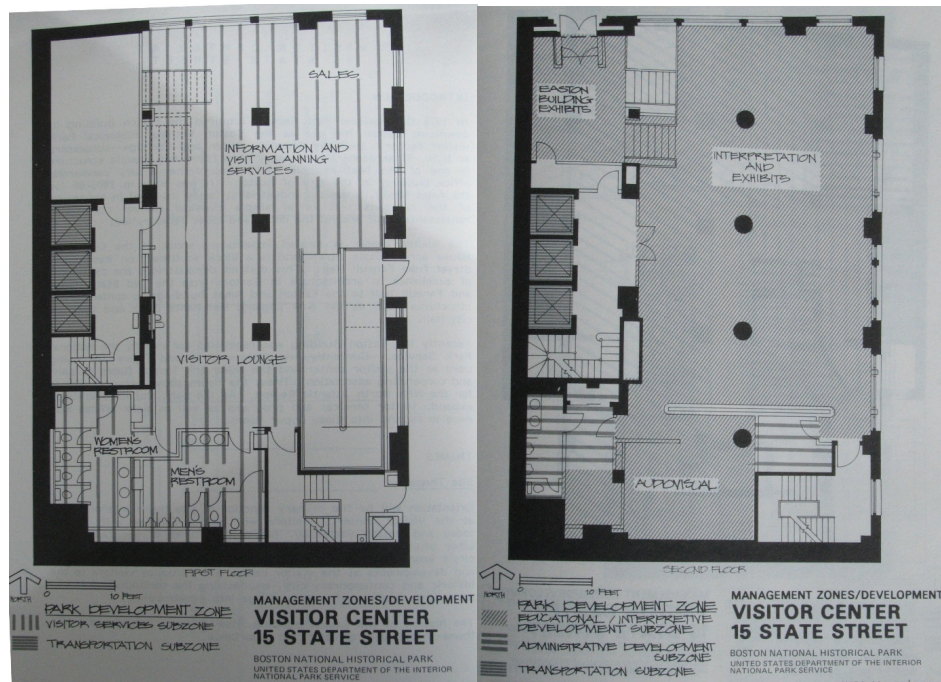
Floor Plans of the downtown visitor center of the Boston National Historical Park (General Management Plan 1980)
